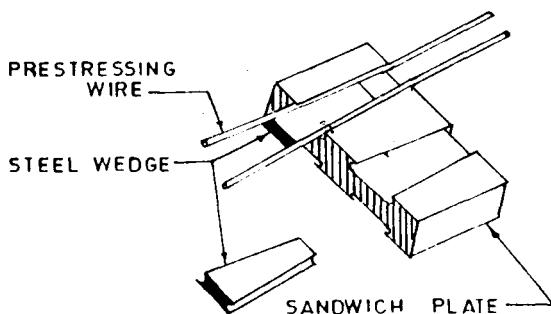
ANCHORAGE FOR MAGNEL-BLATON SYSTEM
